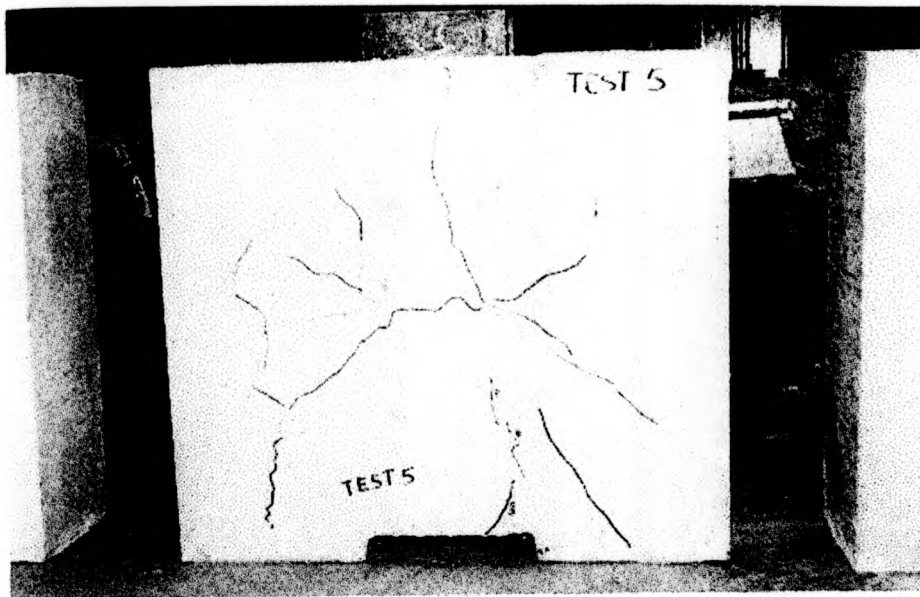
Concrete cracks pattern of PT5
